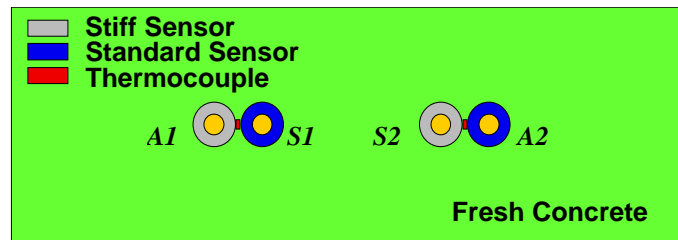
Emplacement of sensors in concrete slab (cross-section)
